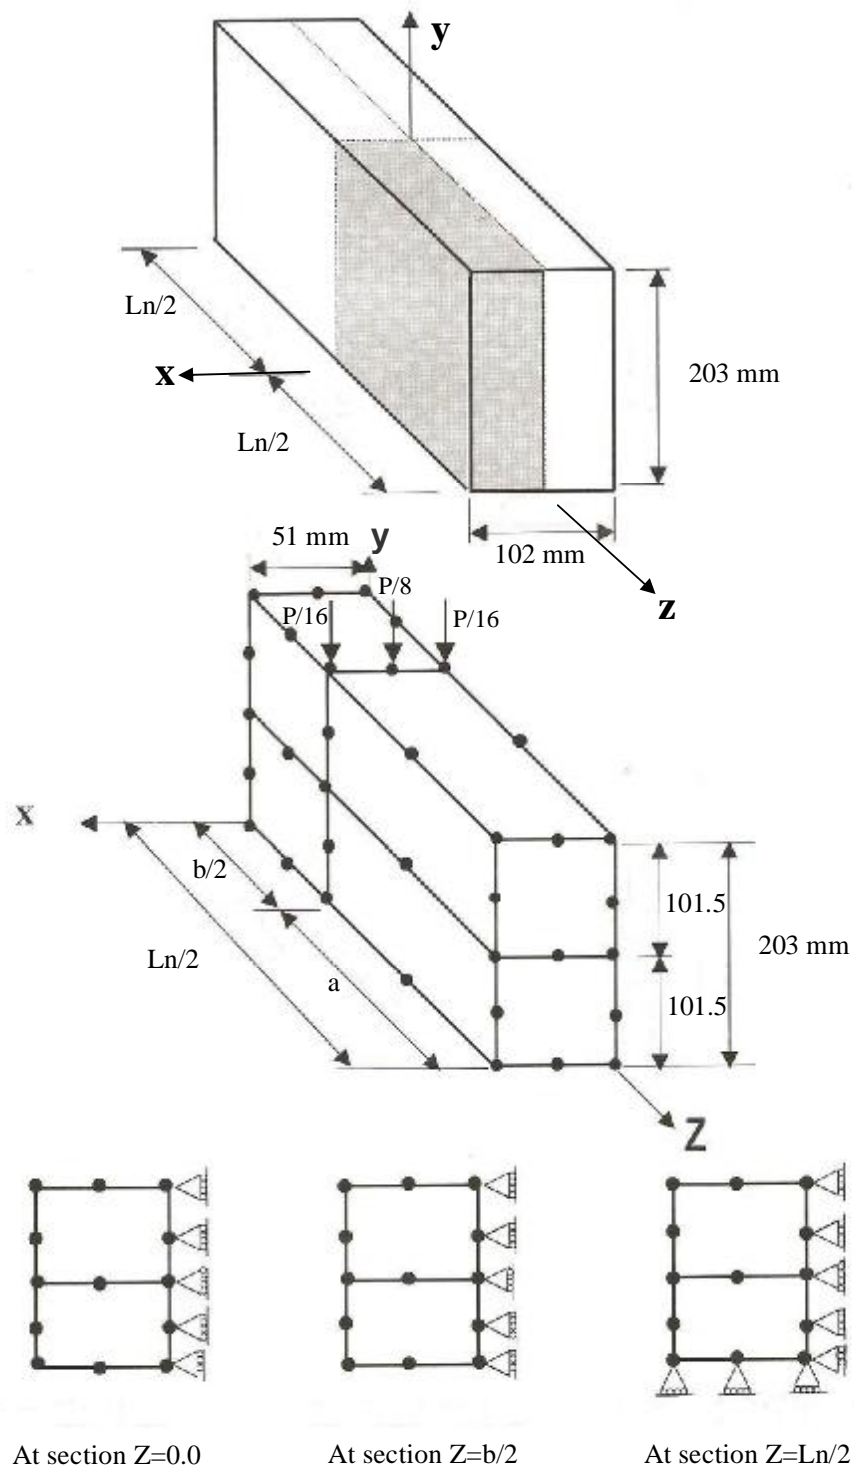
Finite element mesh, boundary and symmetry conditions used for a typical tested beams
